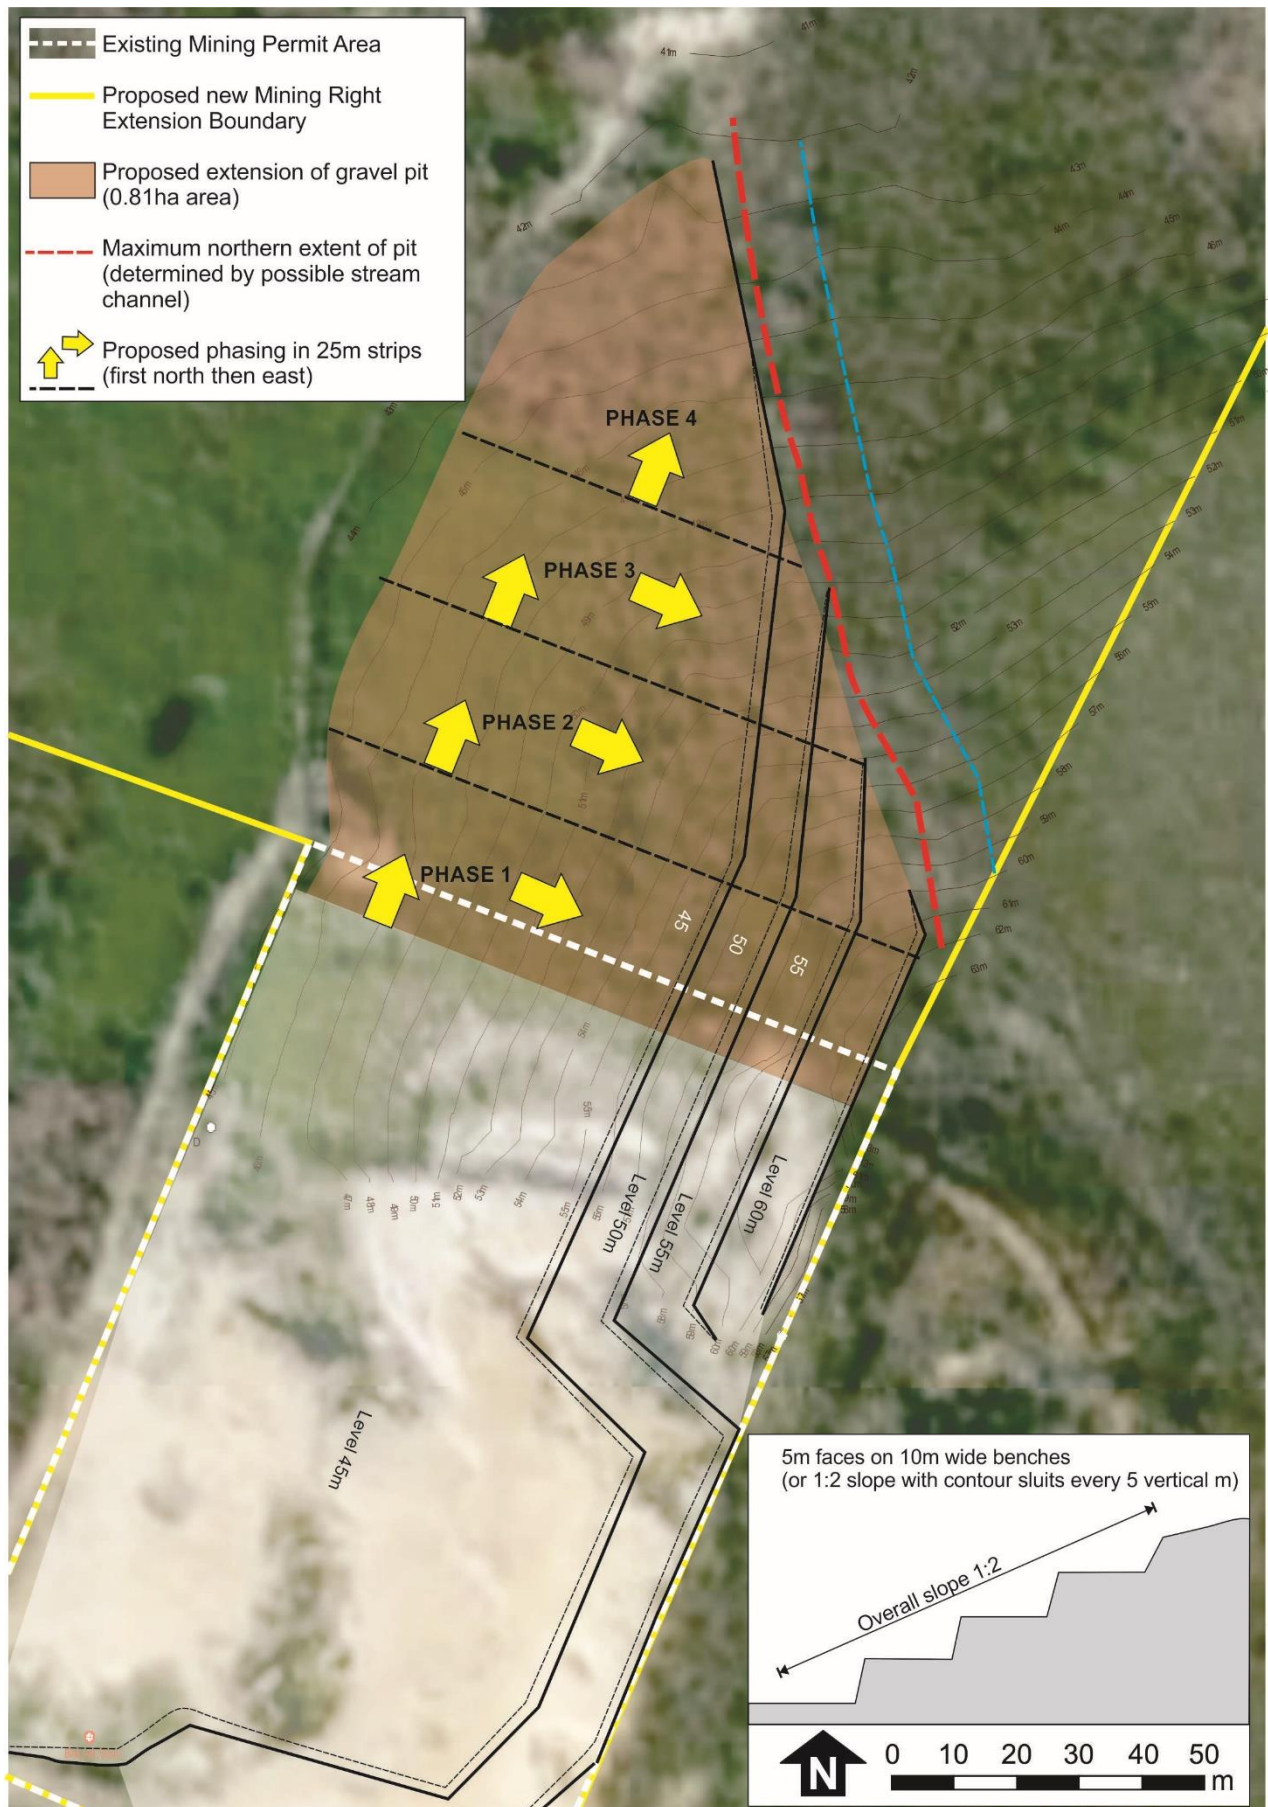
Site Layout Plan; Gravel Mining, Measuring 0.81ha
